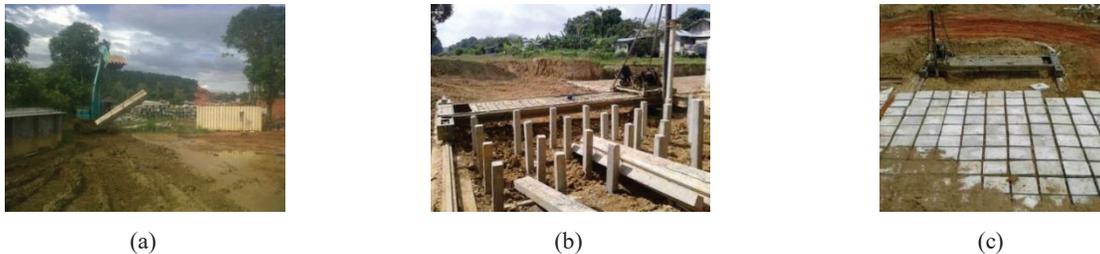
Concrete mattress with micro piles for sub-base improvement
